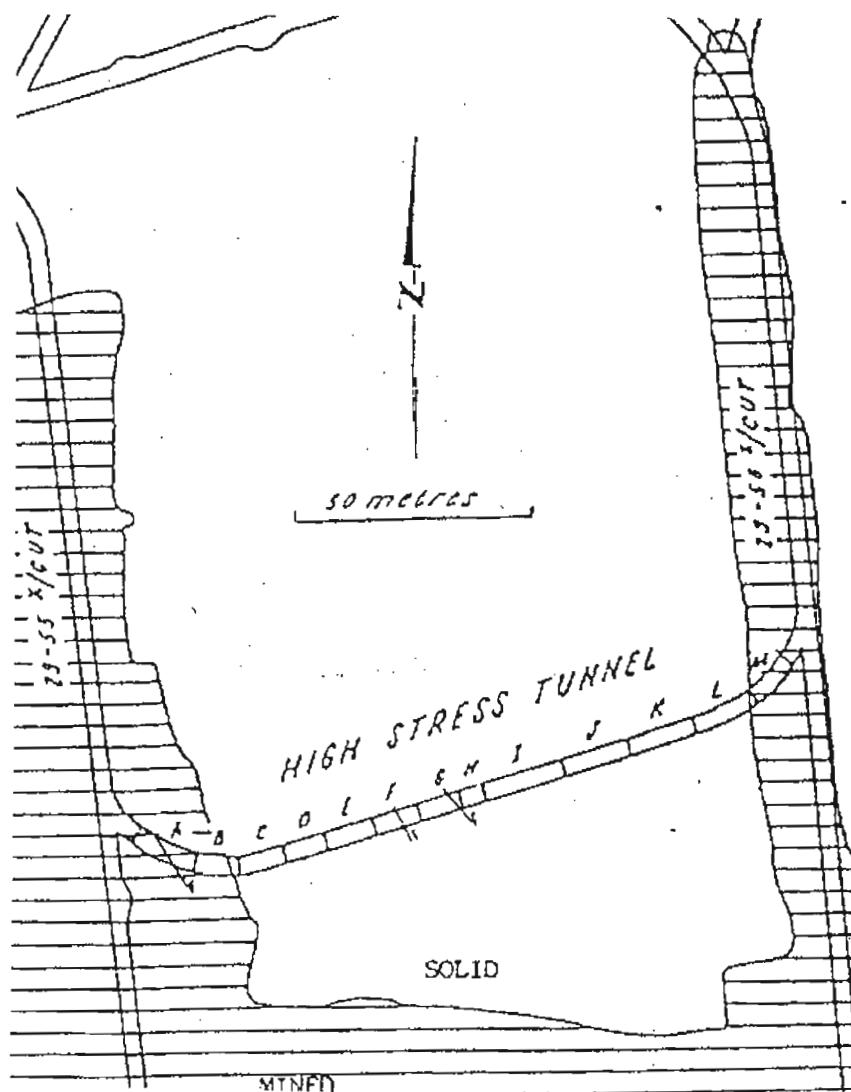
Detail of tunnel support sections (after Hepworth, 1985).
